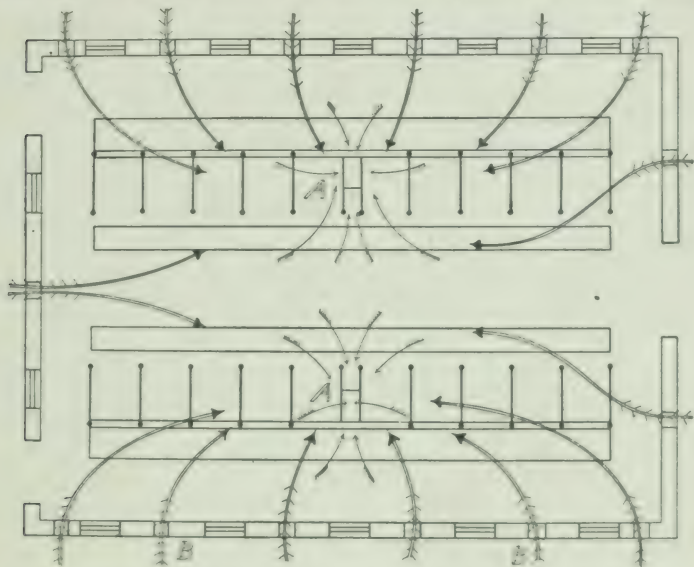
Floor plan of dairy stable, Fig. 32, showing fresh air intakes on all sides at the large arrows crossing the walls; two ventilating flues are AA and the air approaching them along the floor level indicated by the small arrows.
